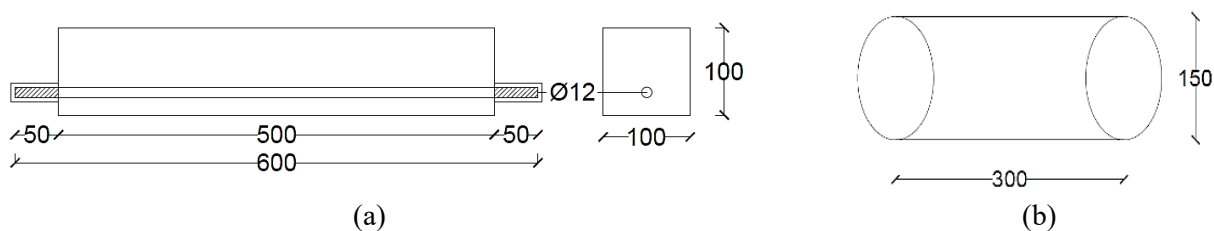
Specimens: (a) Beams and (b) Cylinders (in mm).
